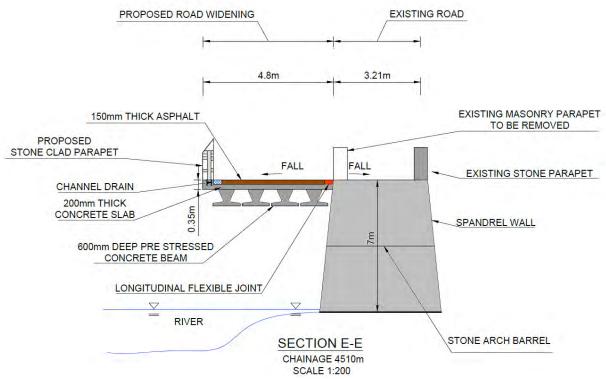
Indicative Section through proposed new structure and existing Gosen Bridge (Drawing 60283248-D-008-002)
